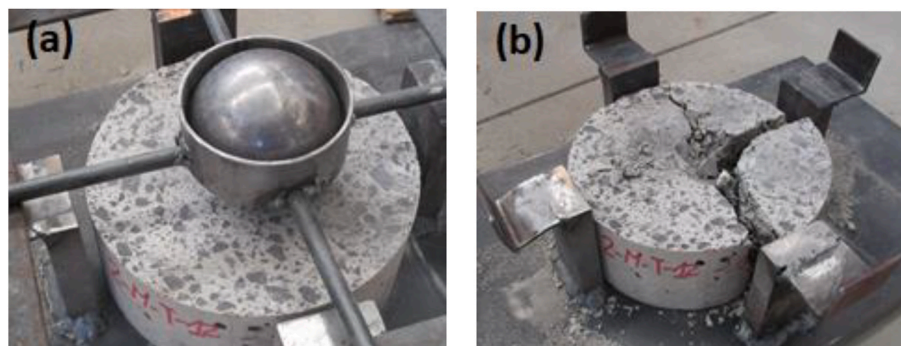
Impact strength test: (a) test arrangement; (b) broken specimen.
